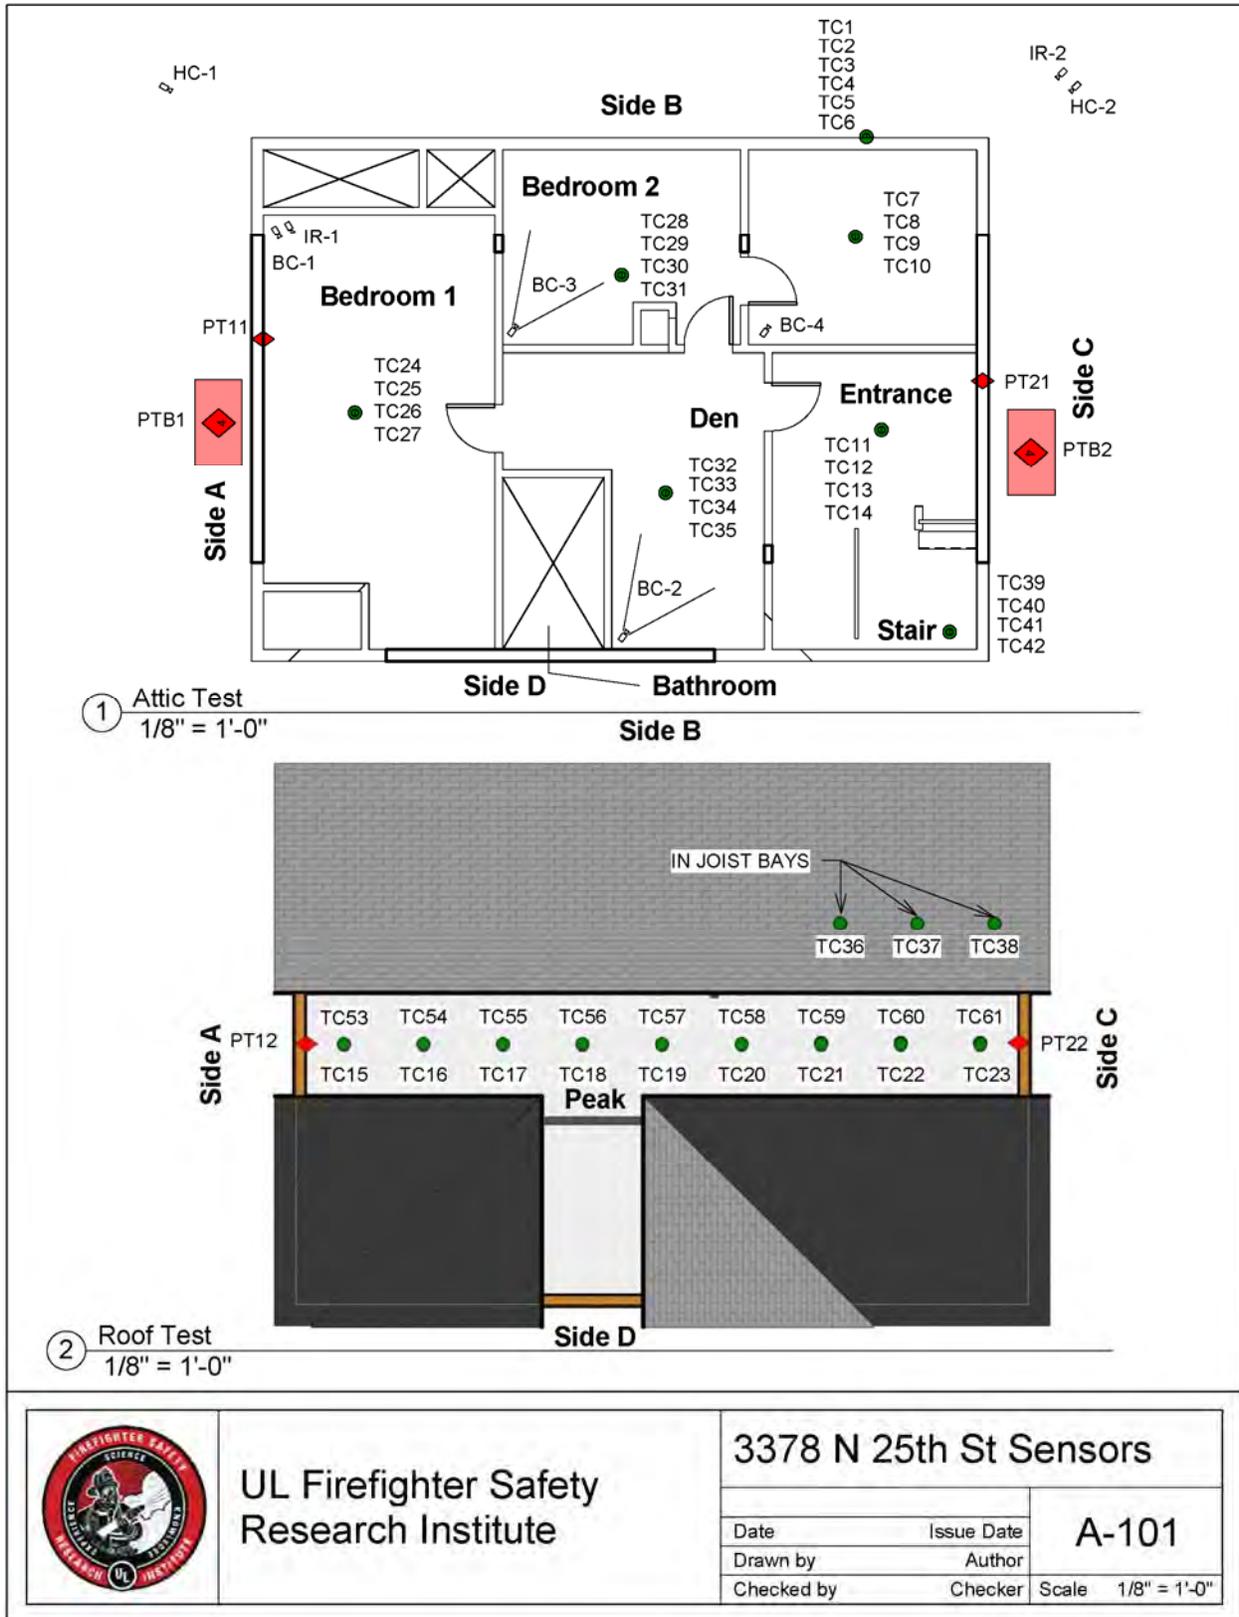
Field Experiment 3 – 3378 N 25th Street Sensors Plan View
